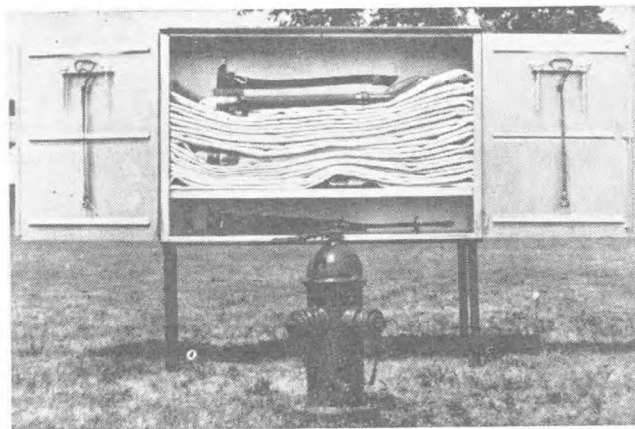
Hose house of steel or aluminum construction. This type can be installed on legs as illustrated or installed on a wall near, but not directly over, a yard hydrant.
